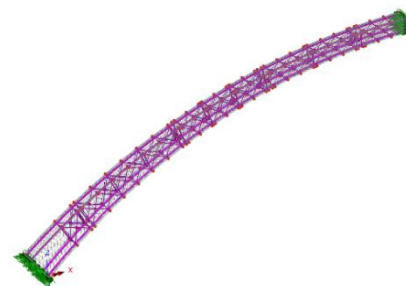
Steel Truss Configuration visible without Concrete Volumes
